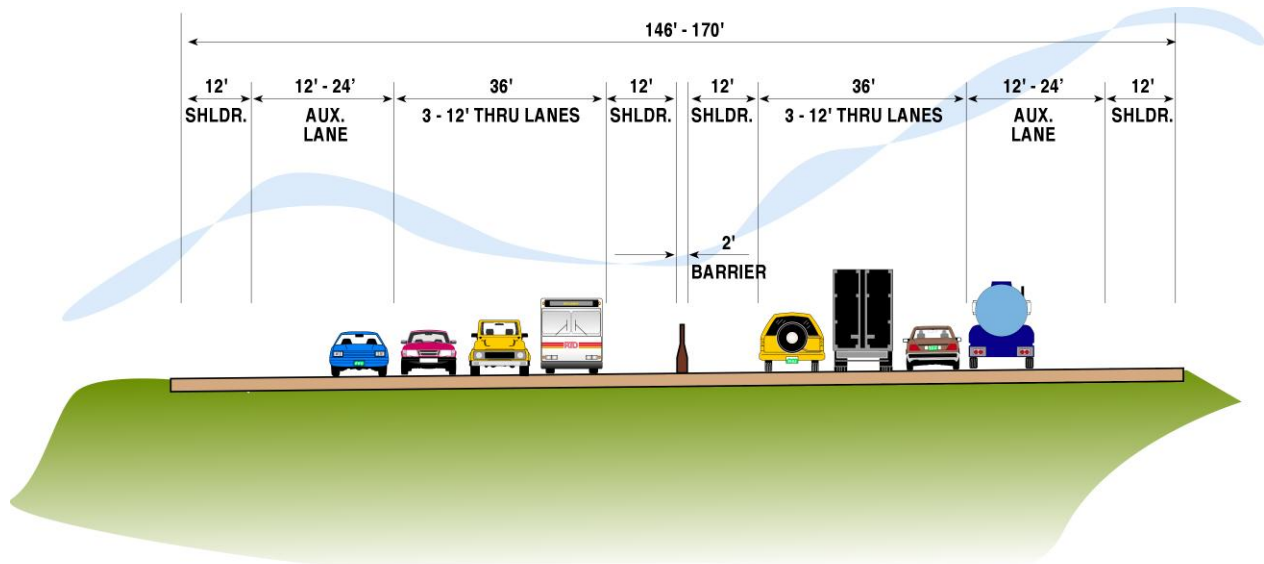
System Alternative 1, US 6 Typical Section, I-25 to Federal Boulevard
